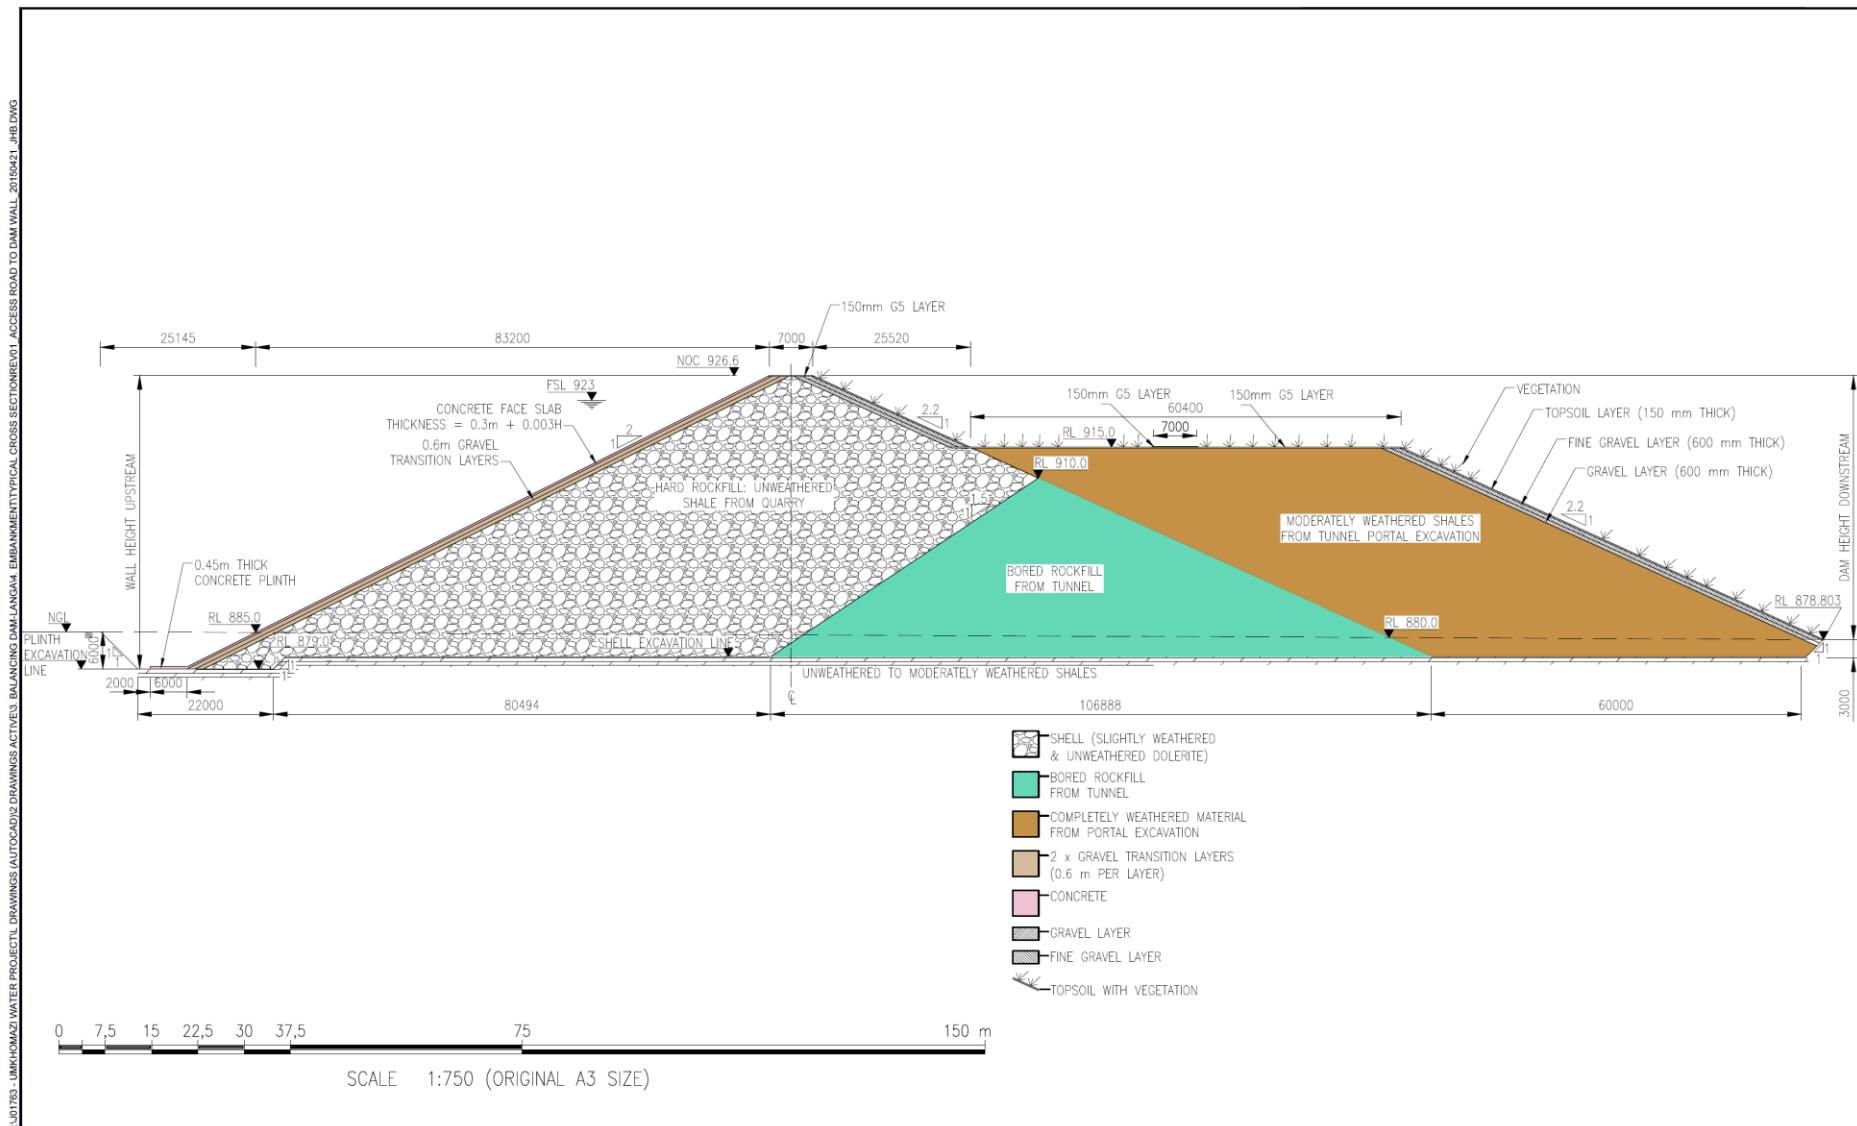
A.3: Langa Dam proposed embankment cross section with vegetated downstream slope
